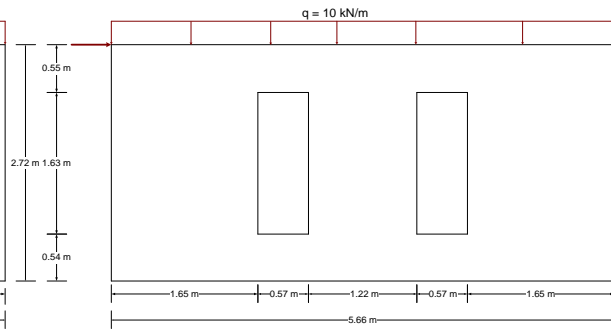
Wall 3: Irregular wall with $i_o = 0.2$
